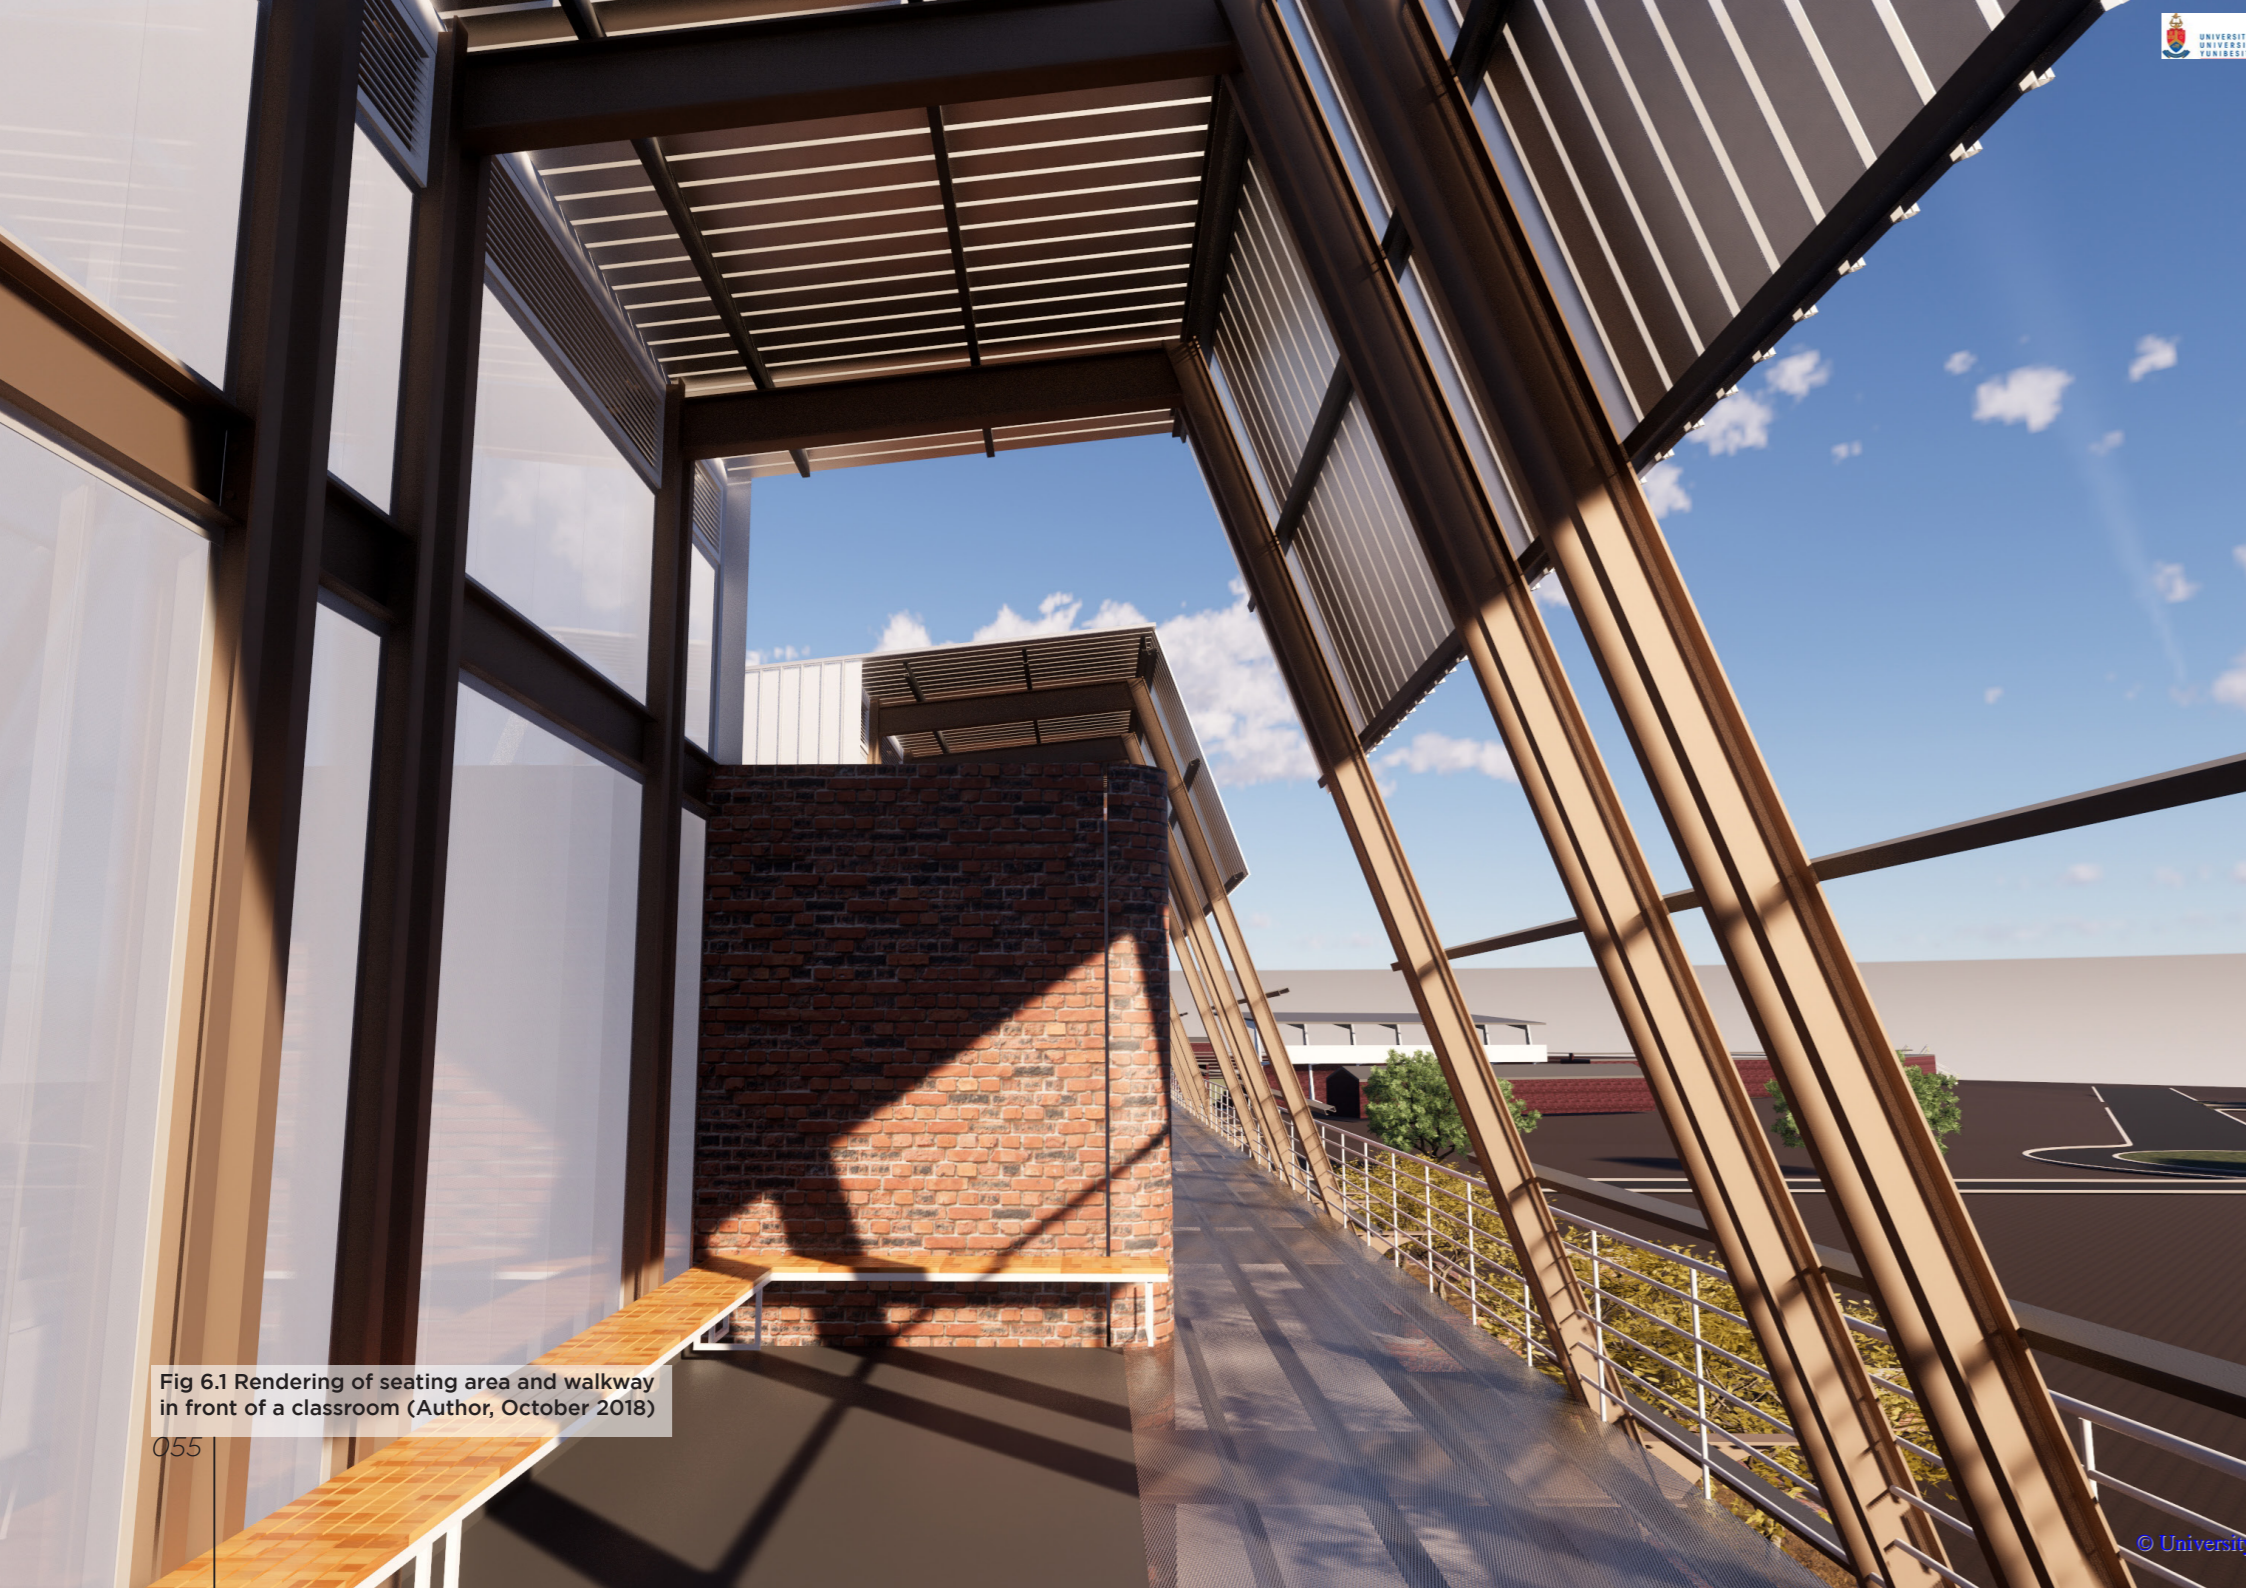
Rendering of seating area and walkway in front of a classroom (Author, October 2018)
